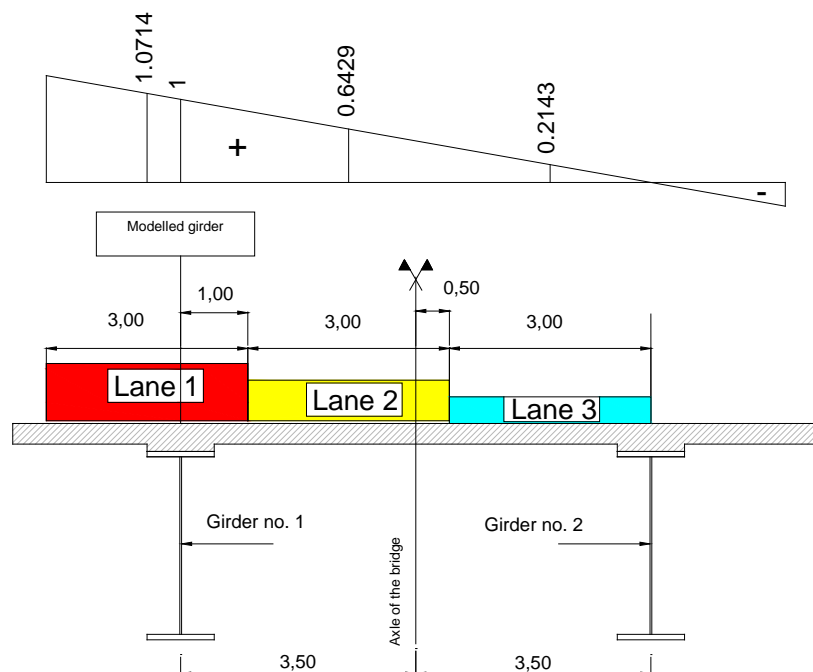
Notional lanes arrangement for global verifications of the main girders
